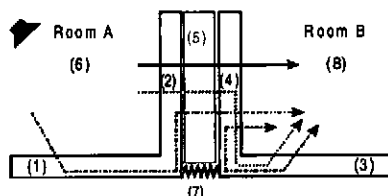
Schematic representation of the sub-systems considered in the model; 1, 3: floor decking; 2, 4: wall leaves; 5: wall cavity; 6: source room; 7: fire stop; 8: receive room.
